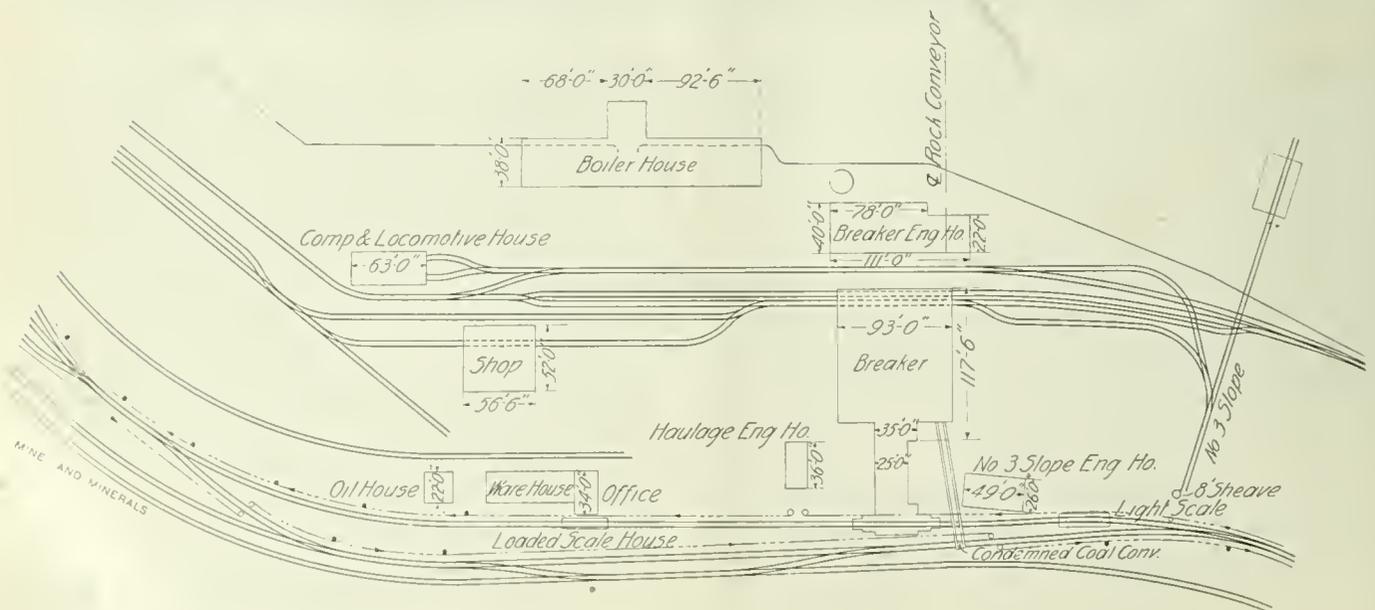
PLAN SHOWING SURFACE ARRANGEMENTS AT BUCK MOUNTAIN BREAKER
